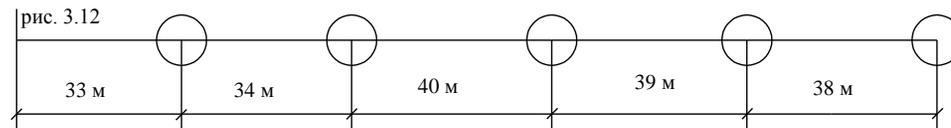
Schematic layout of lighting towers in Ul. Sovetskaya (from 1st per. Lenina to Pl. Lenina), City of Novogradok (layout – one-sided, luminaire installation altitude – 8.5 m)
